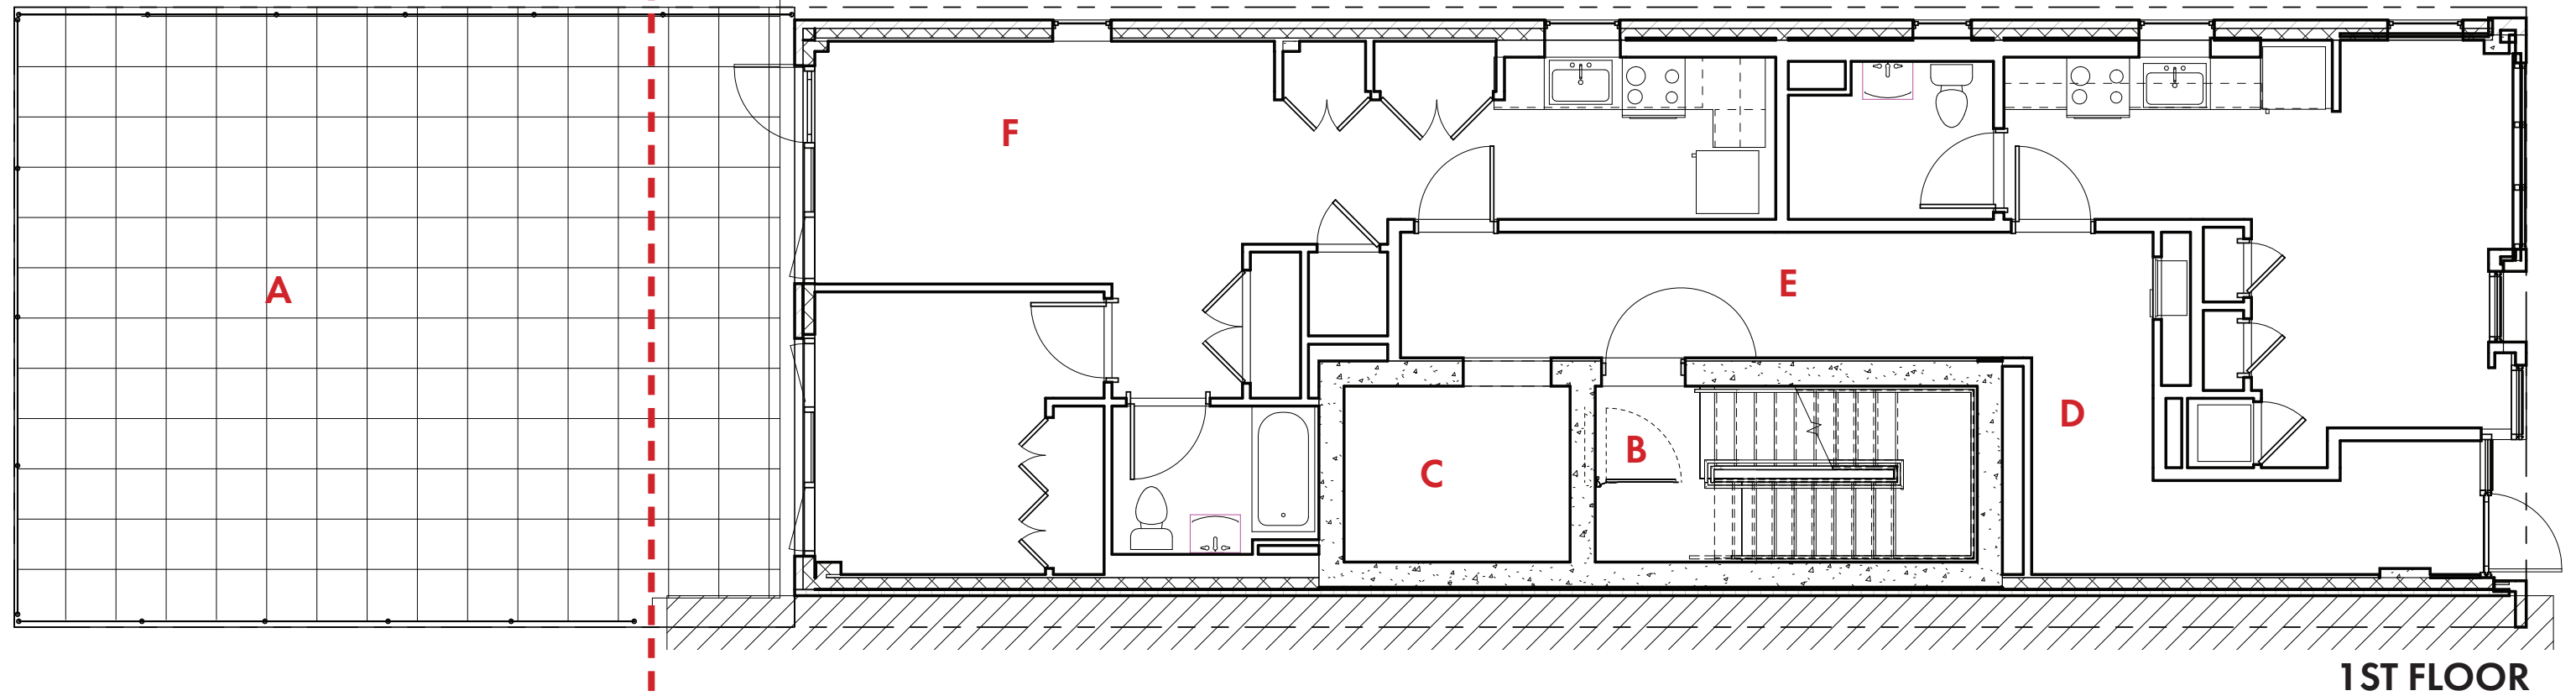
Proposed four-story building with three new floors and three existing floors. 100% increase in Floor Surface Area - is not considered an Alt 1 required to meet NB requirements.
